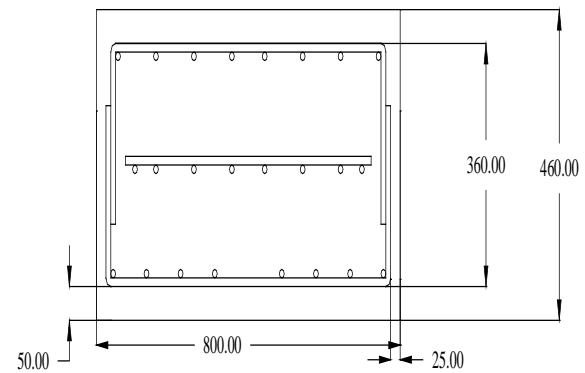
Vertical X-Section of Foundation (All dimensions in mm)
